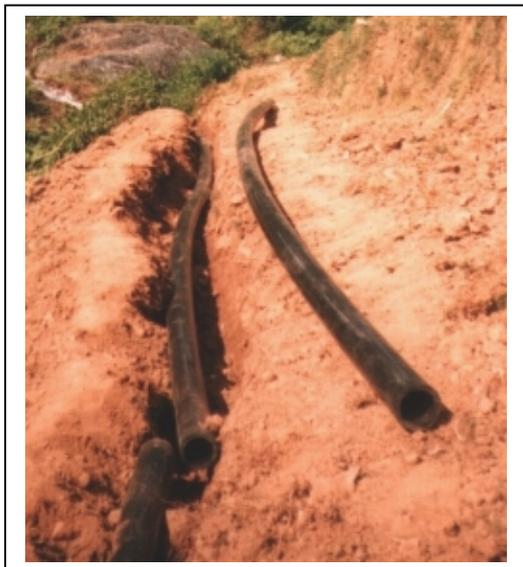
The penstock can be laid in a trench and then buried when the installation is complete to secure it
